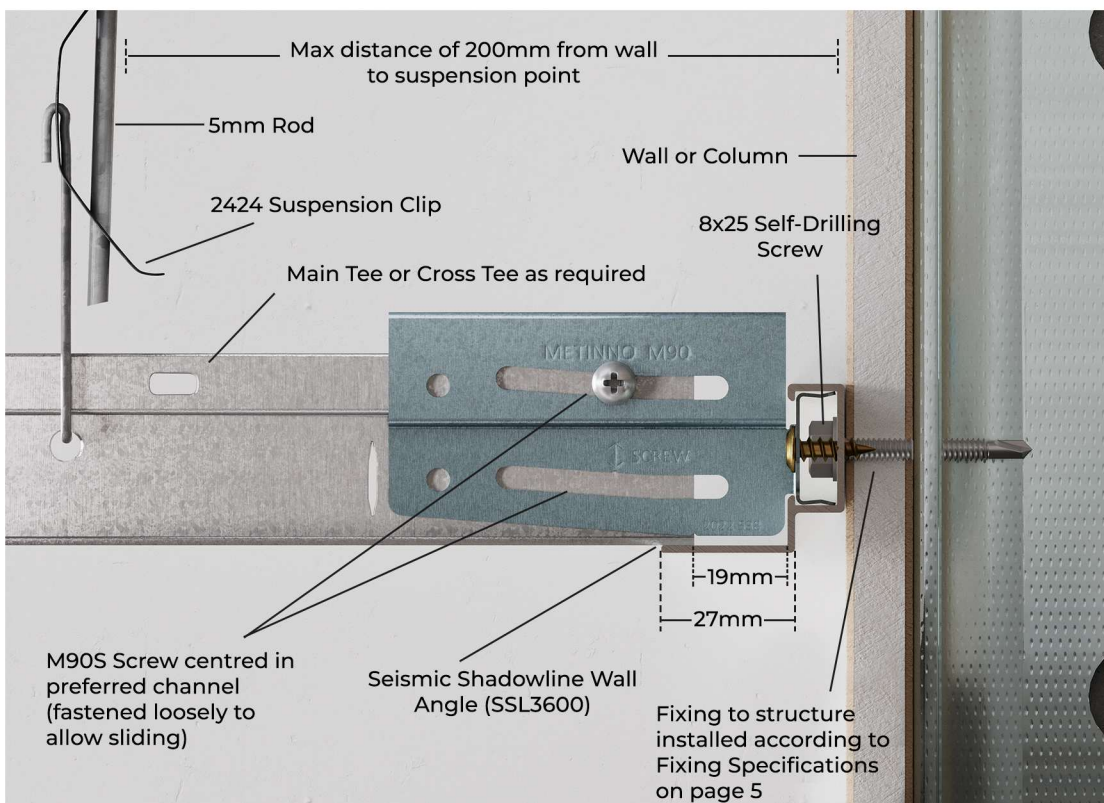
Floating Ceiling-Wall Connection with M90 Clip
